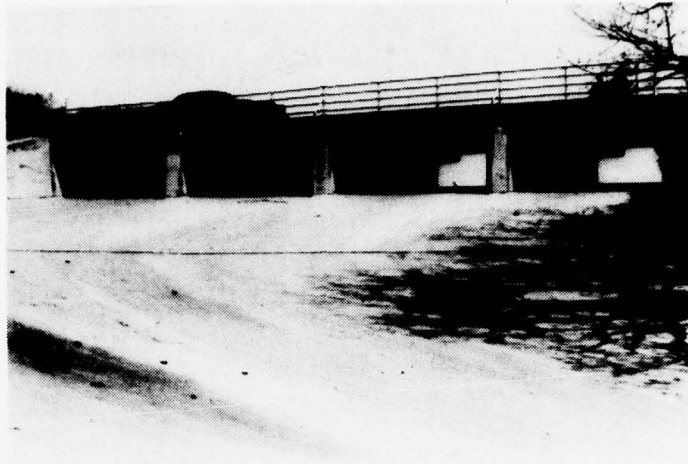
View of spillway chute channel looking upstream at spillway bridge and Church Road; spillway chute turns through an angle of approximately 60 degrees at upper end
